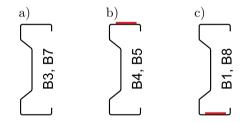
Layout of CFRP tapes on the examined thin-walled beams: a) bare beams, b) CFRP tape bonded to the tensioned flange, c) CFRP tape bonded to the compressed flange.
